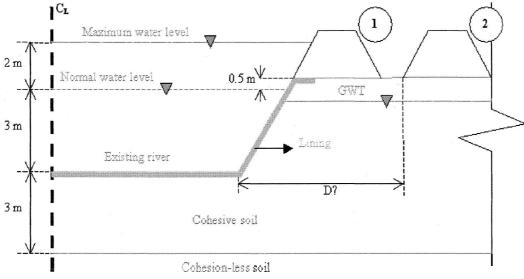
Possible Solutions for Embankment (dike) Construction
